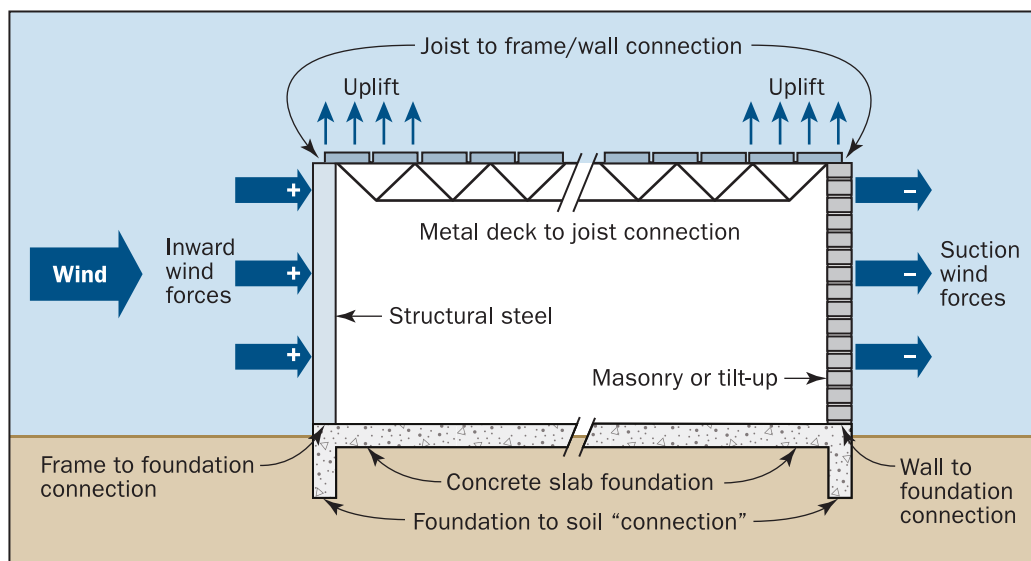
Critical connections important for providing a continuous load path in a typical masonry, concrete, or metal-frame building wall (for clarity, concrete roof deck is not shown)
